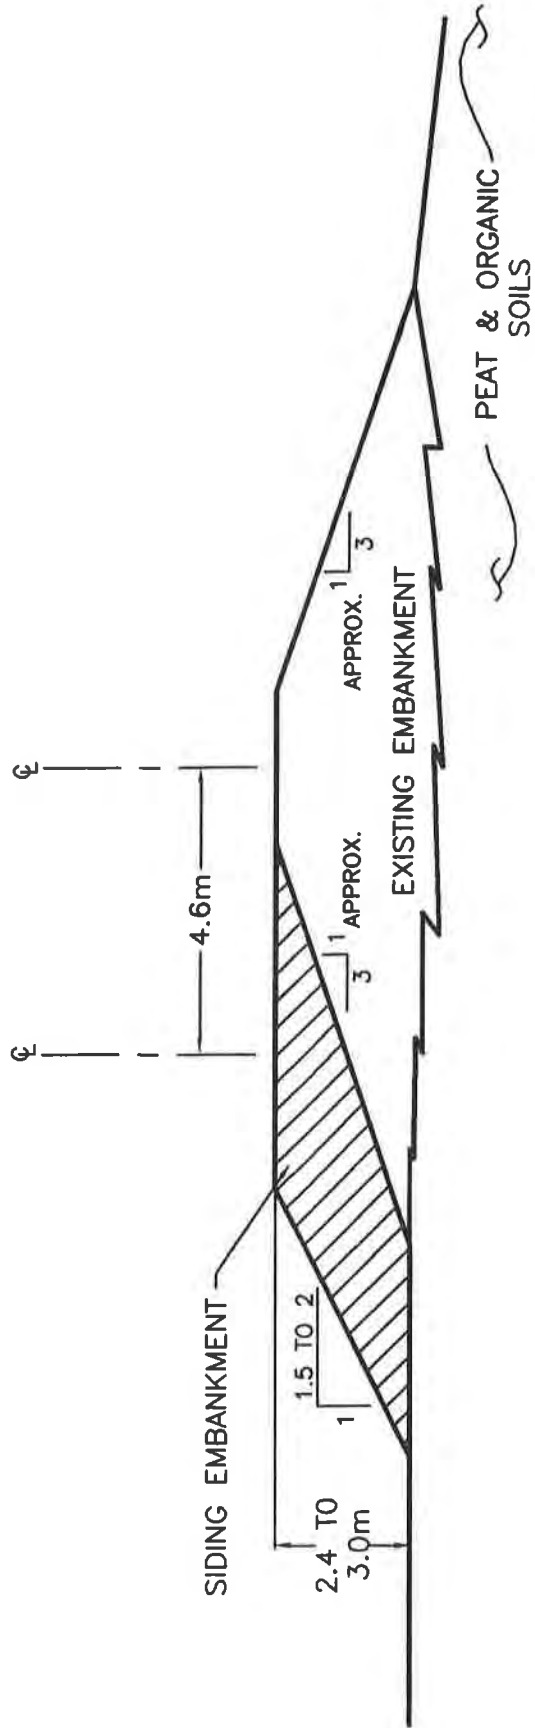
TYPICAL CROSS SECTION OF EXISTING TRACK EMBANKMENT AND NEW SIDING
